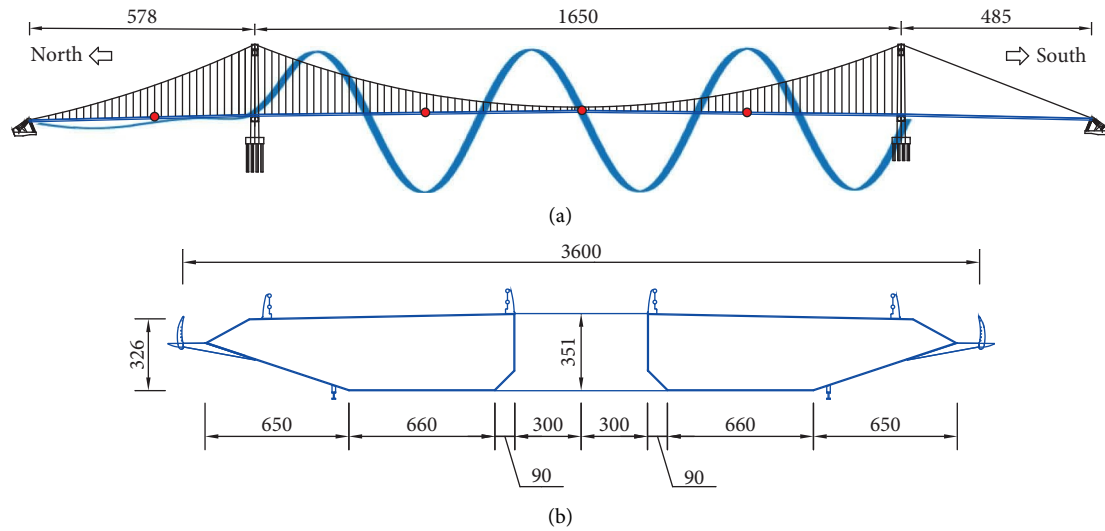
Xihoumen Bridge: (a) elevation view of the bridge (m); (b) cross section of main girder (cm).
